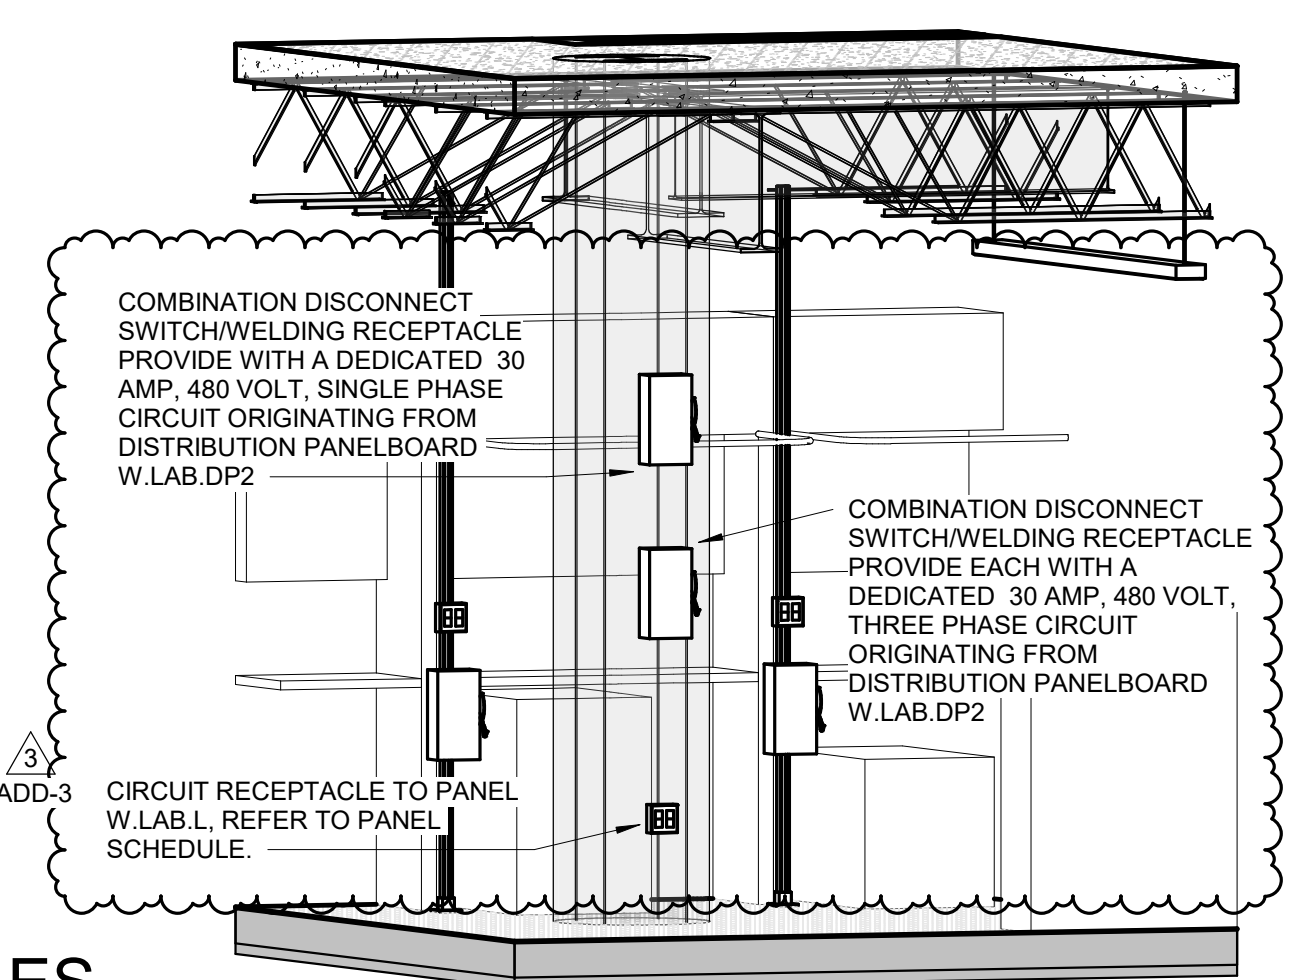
DETAIL - WELDING STATION POWER - BOOTH (TYPICAL)
